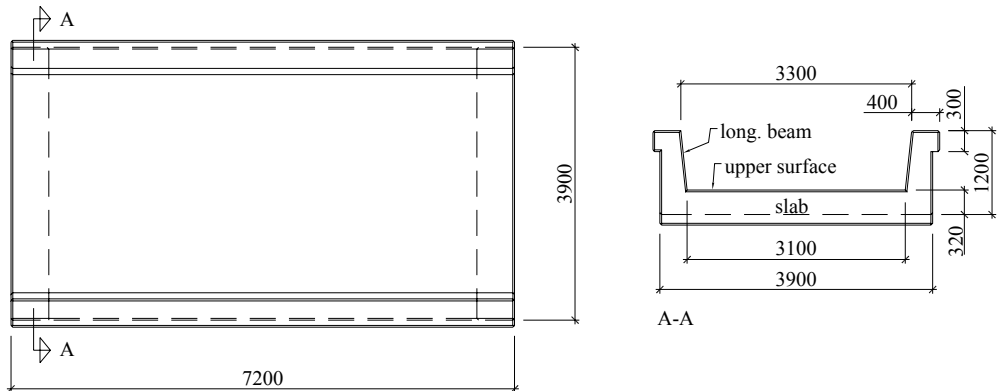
Dimensions and cross-section of the Lautajokki Bridge– a typical Swedish reinforced concrete railway trough bridge. The bridge had a length of 7.2 m and a width of 4.1 m and was built in 1967.
